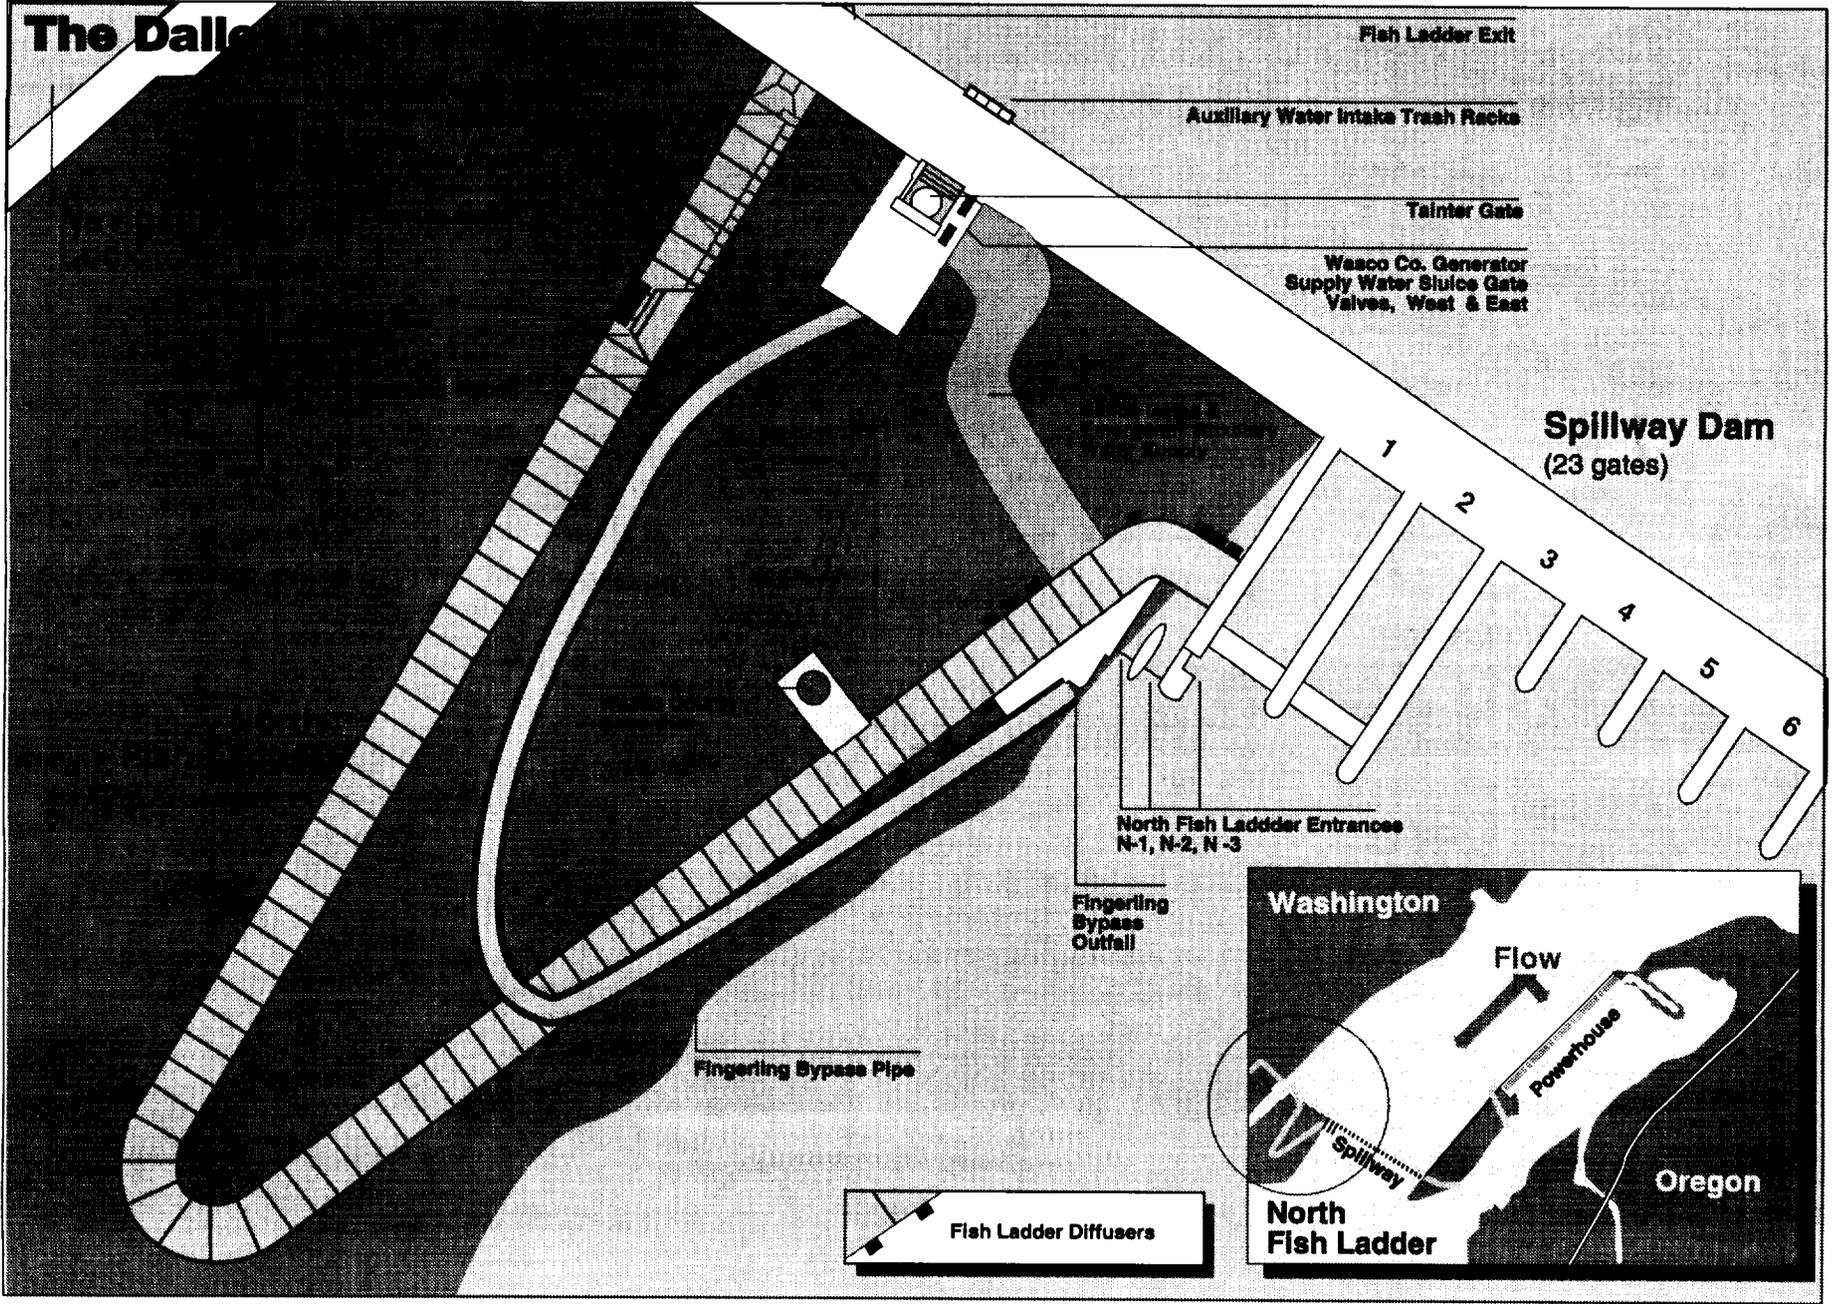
The Dalles Dam North Fish Ladder and Spillway
